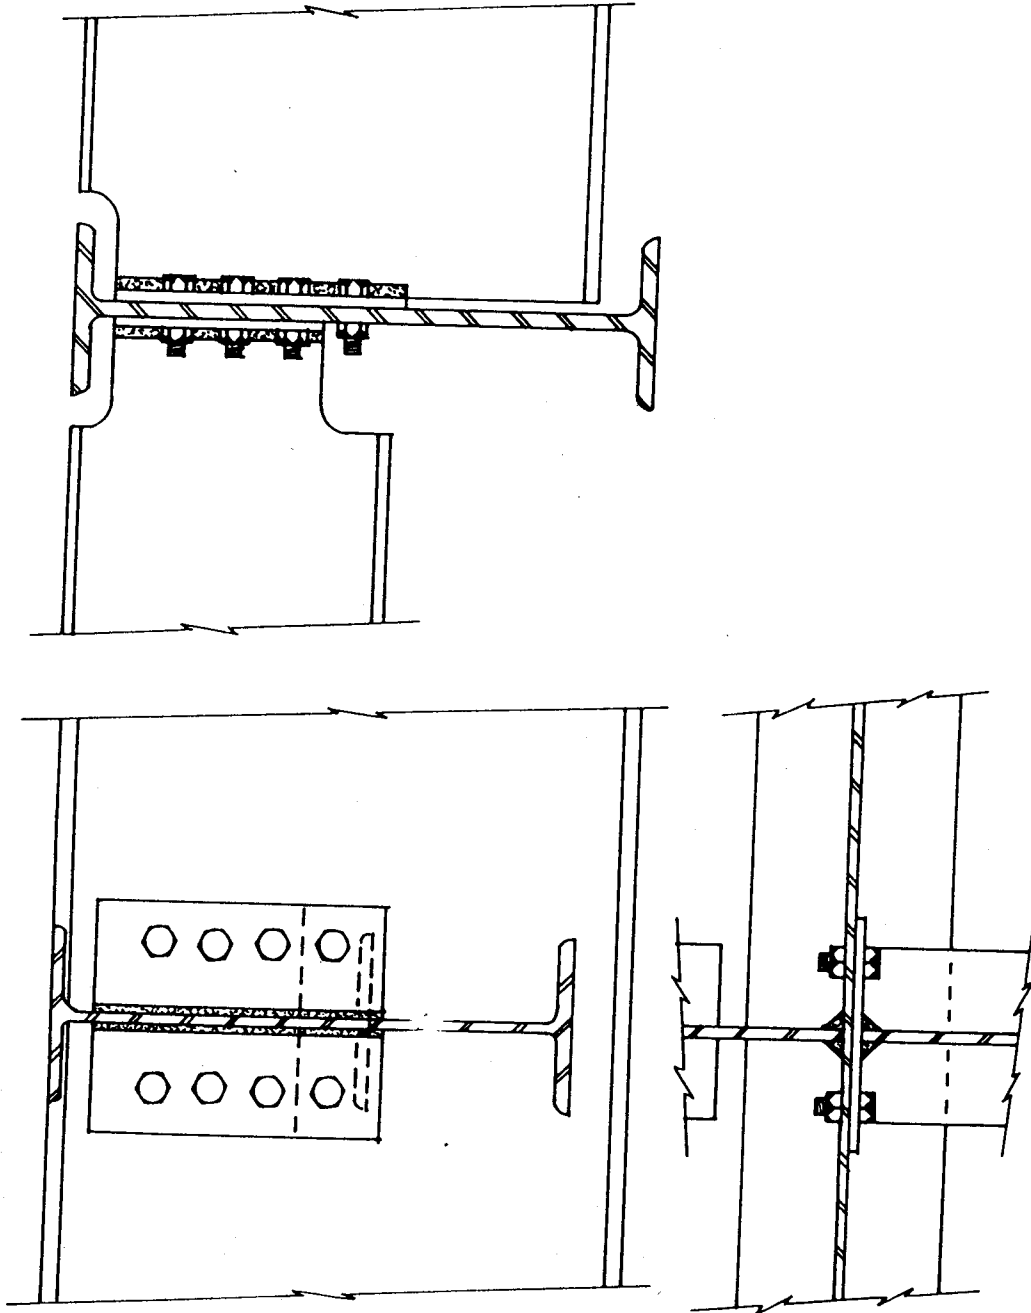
Double Flexible End Plate Connection to Beam Web Detail
